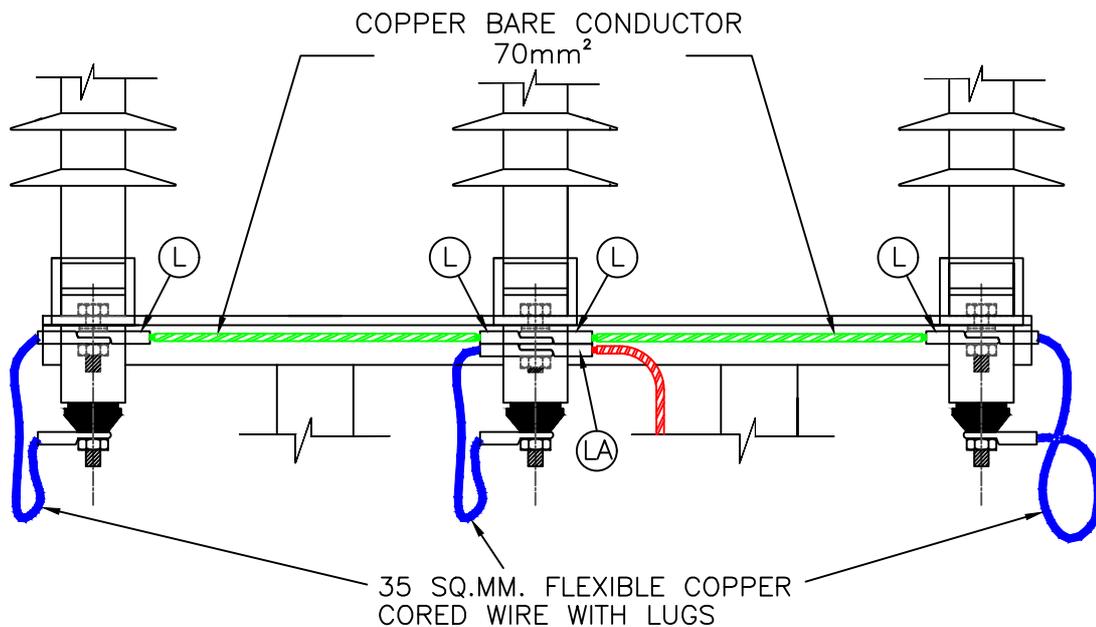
POLE MOUNTED TRANSFORMER EARTHING DETAILED DRAWING
